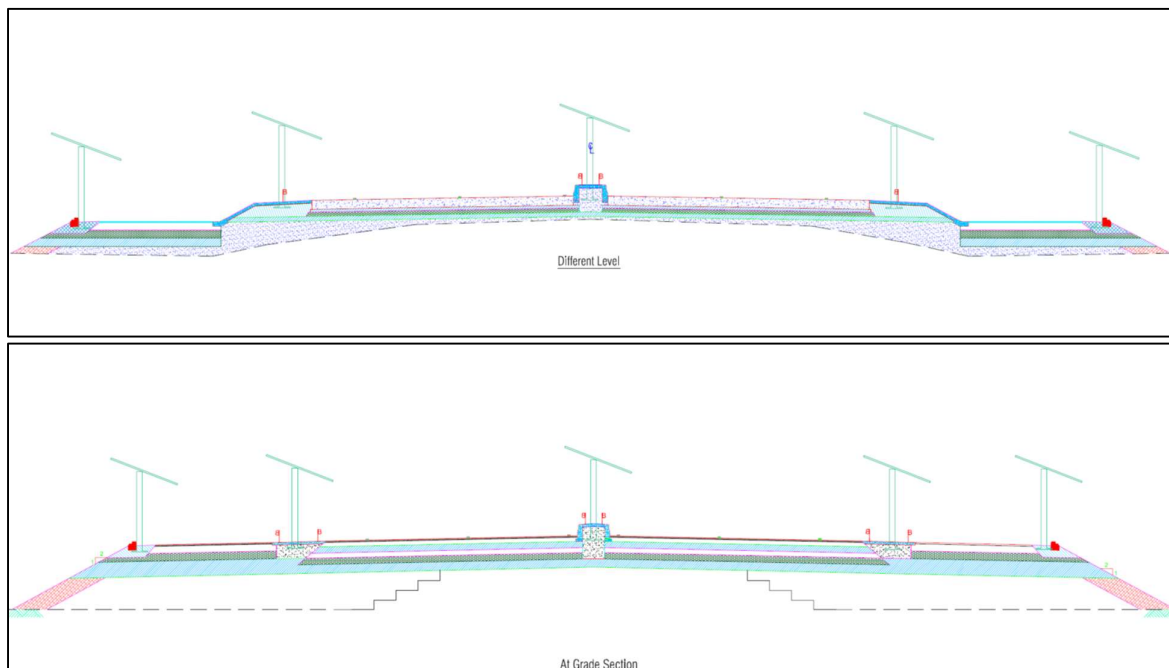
The SASEC Road Connectivity Project-2 typical road cross section for Solar Setting
